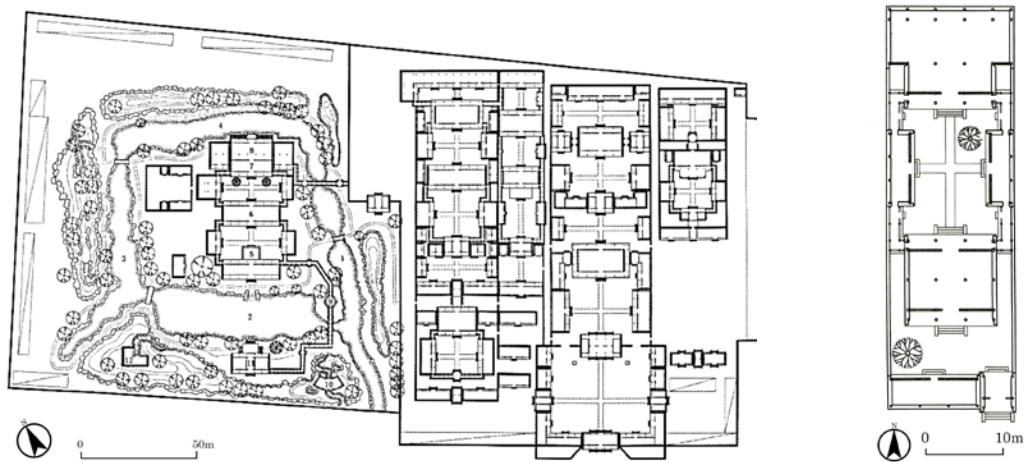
4 The Plan of Chunwangfu Garden (Left) and Yuewei Caotang Garden (right)
